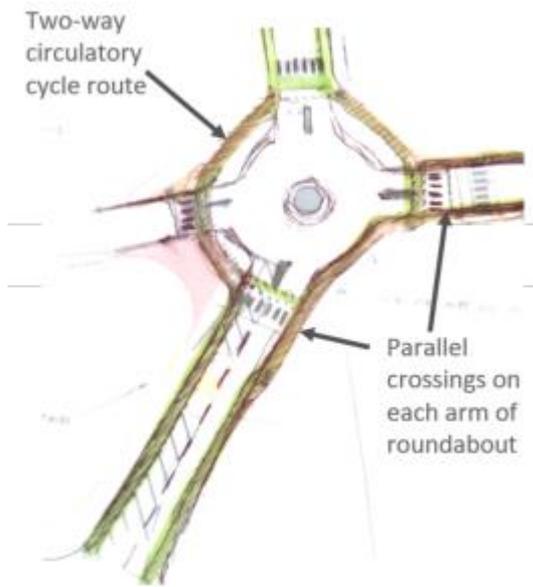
Sketch idea 3: continental geometry with parallel crossings. We do not have traffic flow and modelling information or survey to provide a detailed alternative proposal.
